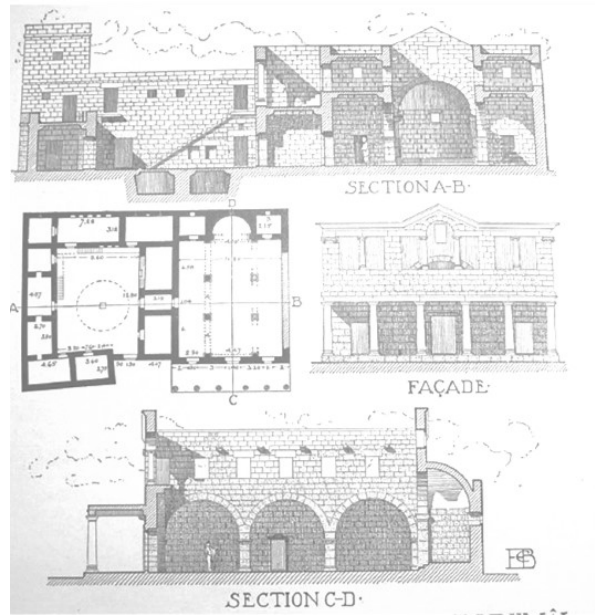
Church of Numerianos plan, sections and façade, (*Butler, 1929, p. 118*)
